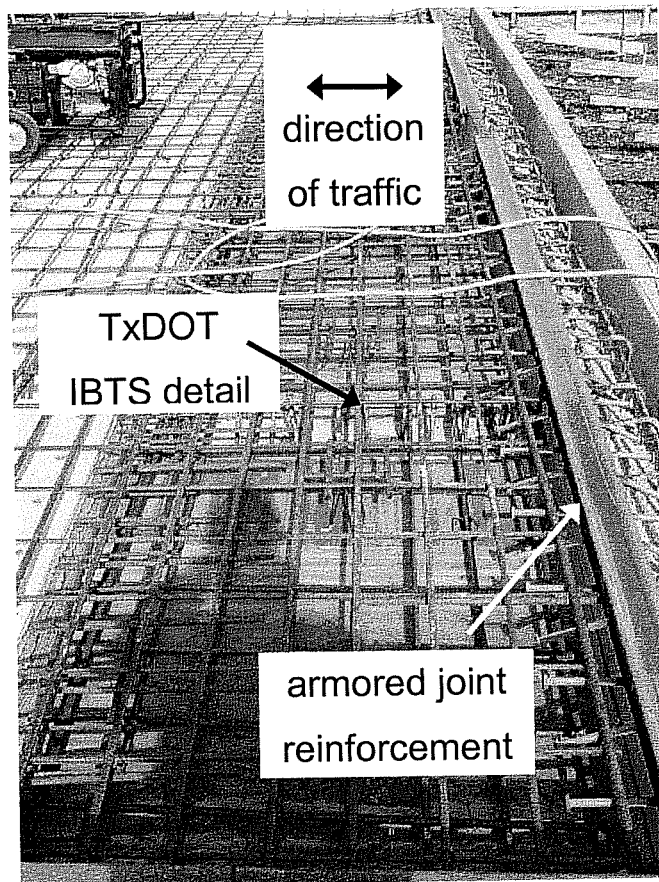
IBTS detail prior to concrete placement (Ryan 2003)
